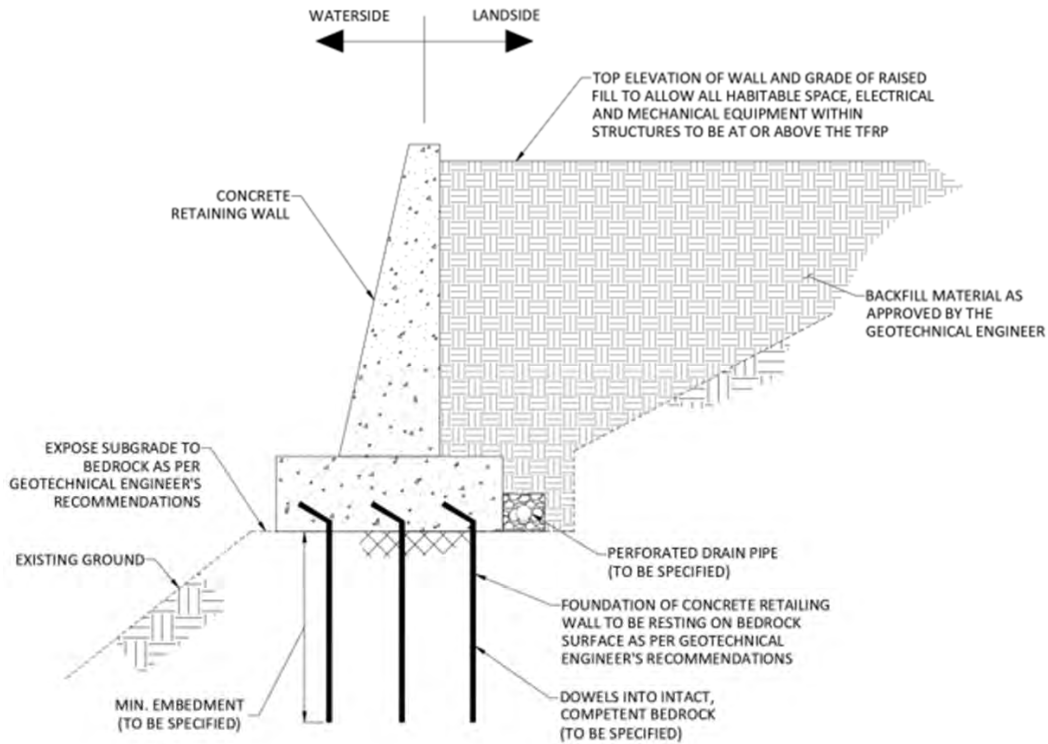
Conceptual Typical Section for Option 2 with Concrete Retaining Wall
